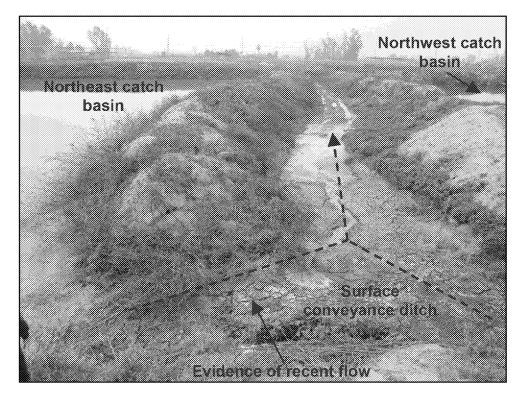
View facing north of the wash water (shown in Photograph 6) outlet structure located in the central portion of the Facility, downgradient of the southern corrals.
